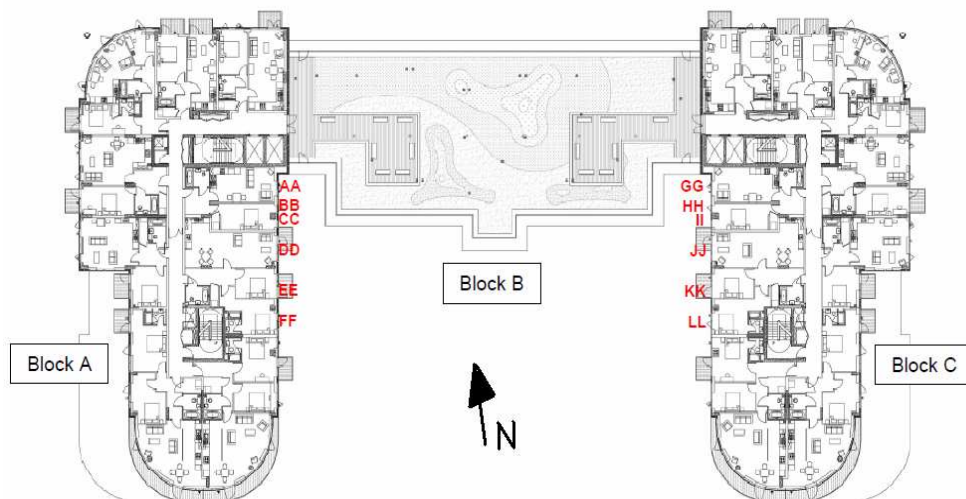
Plan of existing 14th floor, based on plan provided by BUJ Architects. This layout is replicated on the 15th floor. The blocks and the window positions analysed have been labelled.
